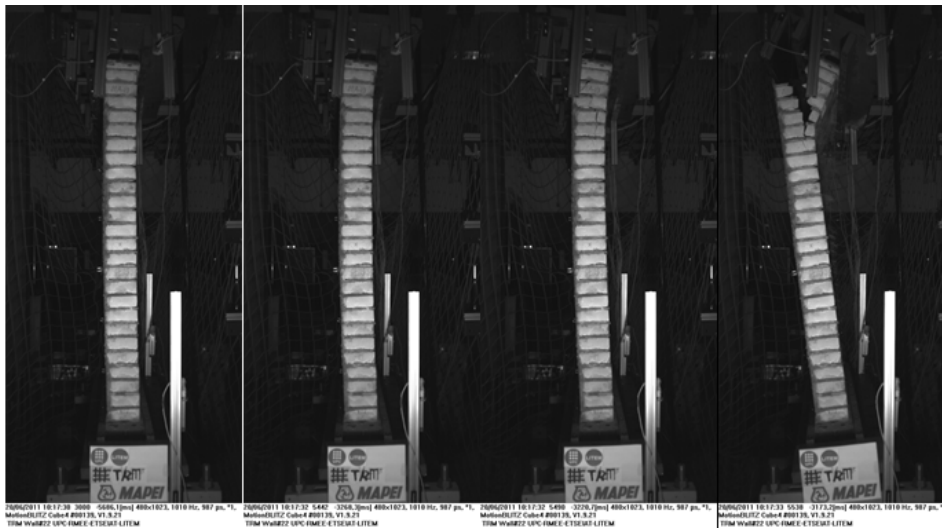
202 Failure of the wall W#22. Masonry failure at wall's top.
